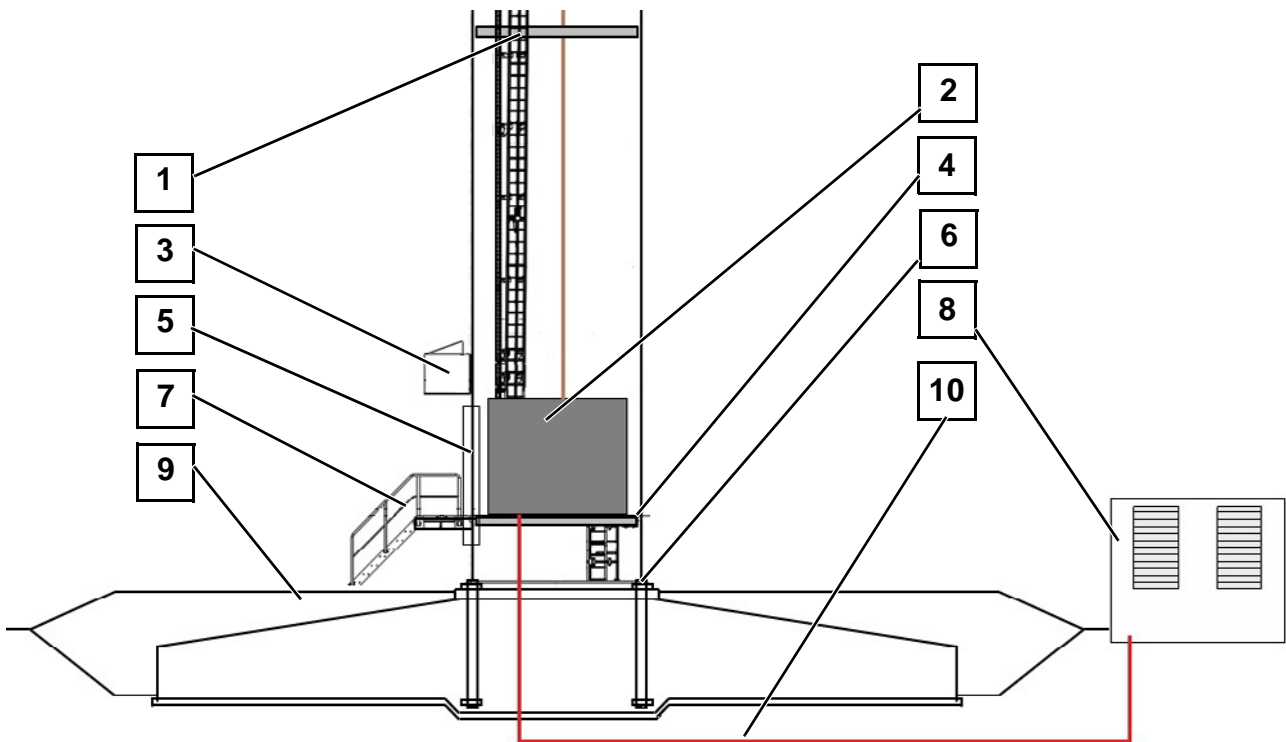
Sectional view of the tower base, variant with transformer outside tower (TAT)
